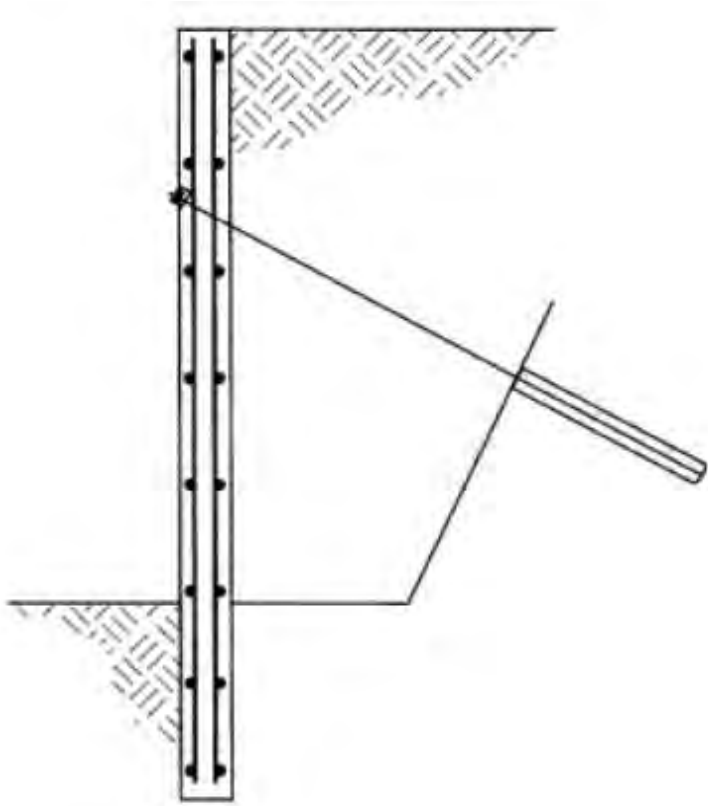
Stage construction of diaphragm (slurry-) constructed concrete wall. (Compliments of Soletanche and Radio, Inc.)
